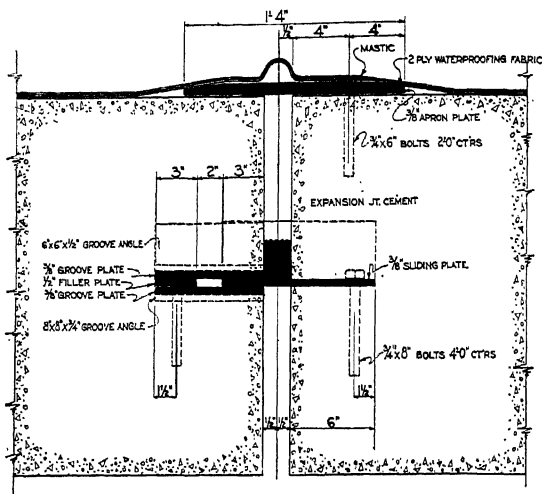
Expansion Joint Device Deck Waterproofed—Sliding Plate.
